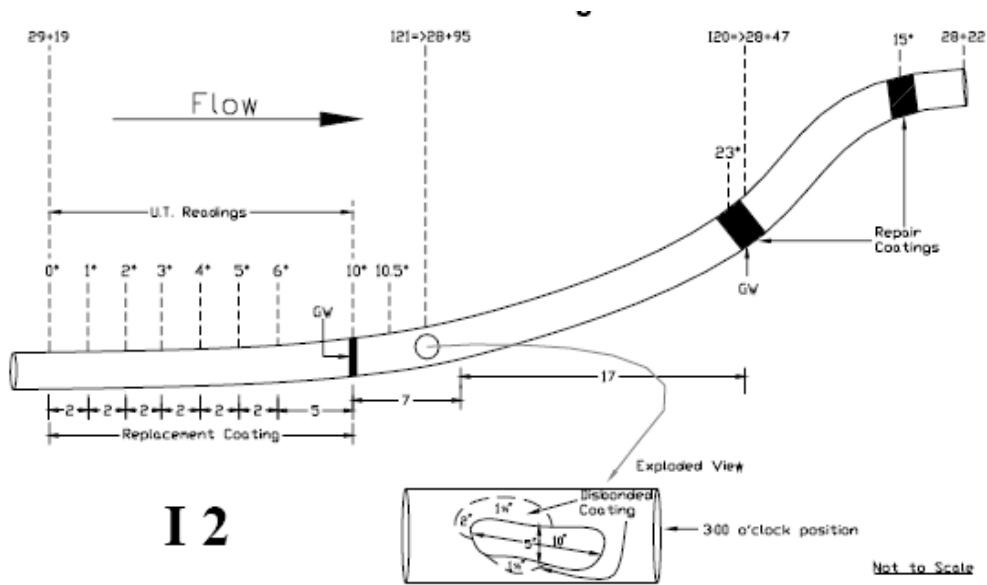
Schematic of Pipe Elevation at DG-ICDA Site 2
